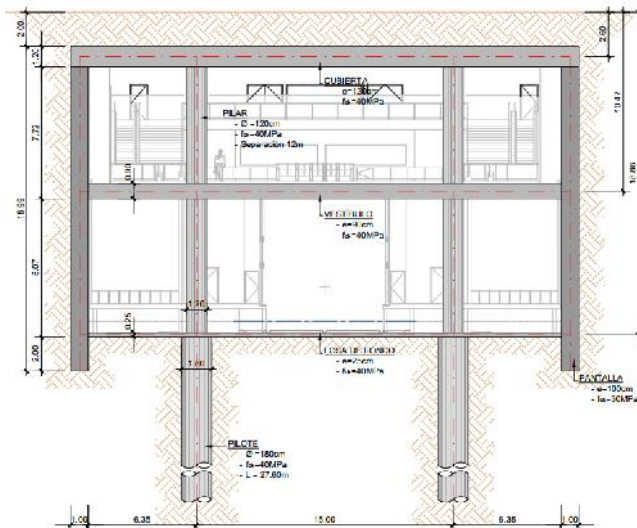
S09 section. [fck=40MPa for all elements except for the 100cm-thick retaining walls - fck=30MPa- , -fyk=420MPa-. Thickness of slabs are 120cm for ceiling, 90cm for the hall and 25 cm for the bottom slab. Columns and piles are 120cm and 180cm respectively].
